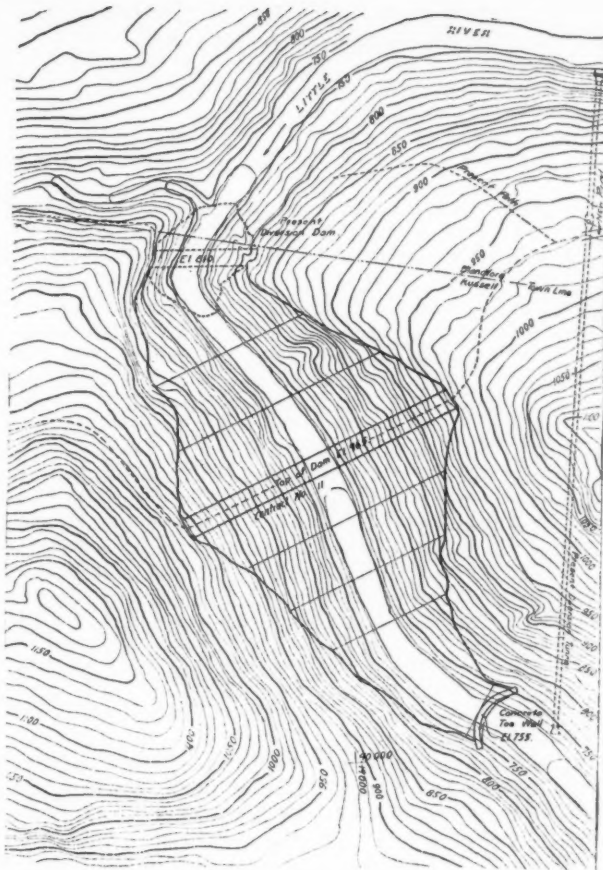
LAYOUT OF DAM AND DIVERSION TUNNEL
